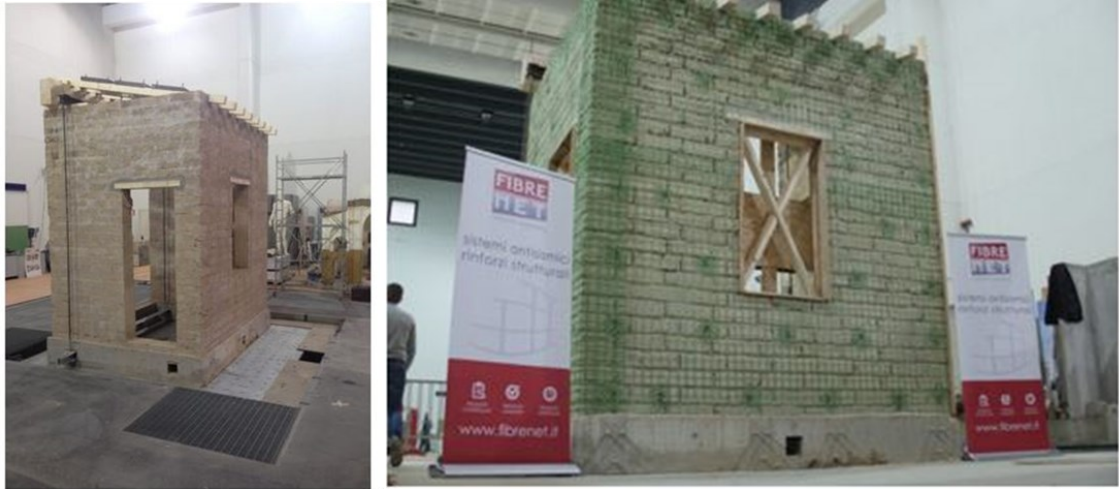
Shaking table tests on unreinforced and reinforced U-shape tuff structure* [58]
